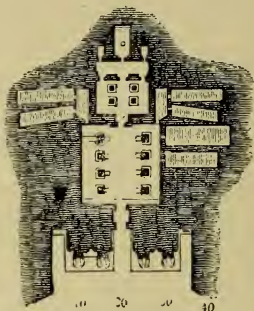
GROUND-PLAN OF THE ROCK-TEMPLE AT IPSAMBOUL.
